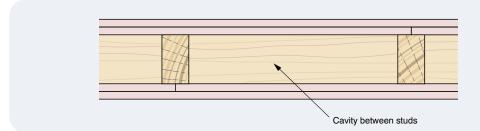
Horizontal section through typical FRL90/90/90:RISF45:NC timber stud wall showing allowable cavity.
